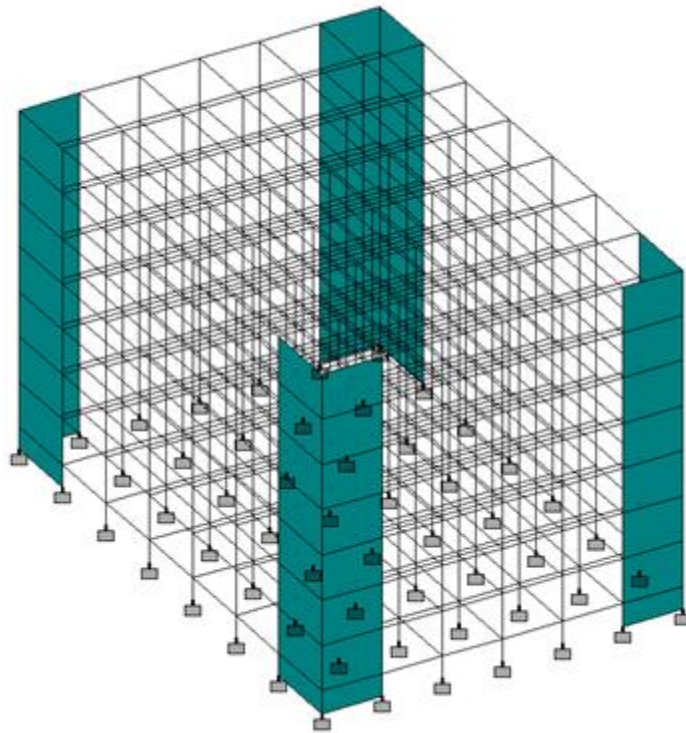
Isometric View of Structure with Shear Walls at Corners
